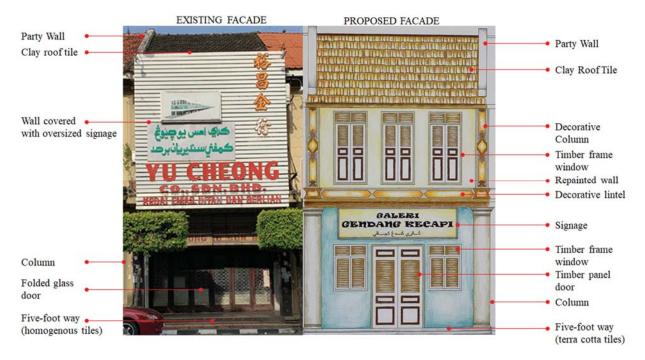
Image shows one of the selected shophouse unit existing (left) and proposed (right) facade after revitalisation
